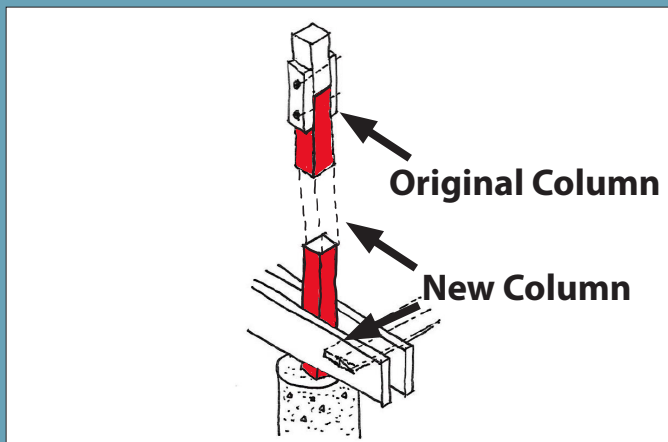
When replacing a missing column, make sure the new column has a strong foundation and that it is securely attached to the existing piece of column.
